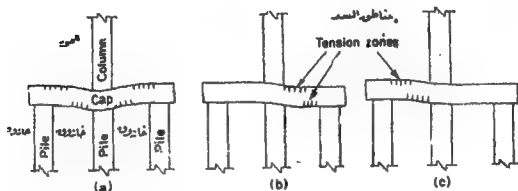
Failures of group pile cap نموذج لرأس مجموعة الخوازيق
